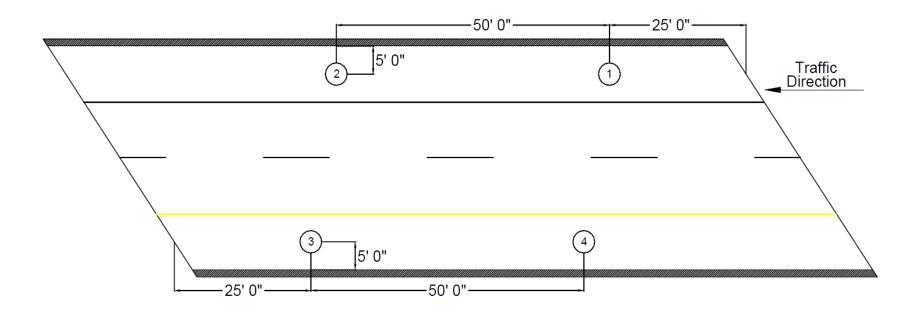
Testing locations in shoulders of Dannon Way bridges.
